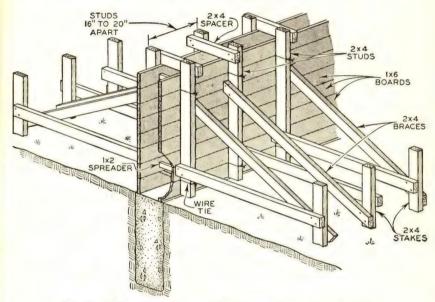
Tailor-Made Formwork for Concrete Foundation or Wall
